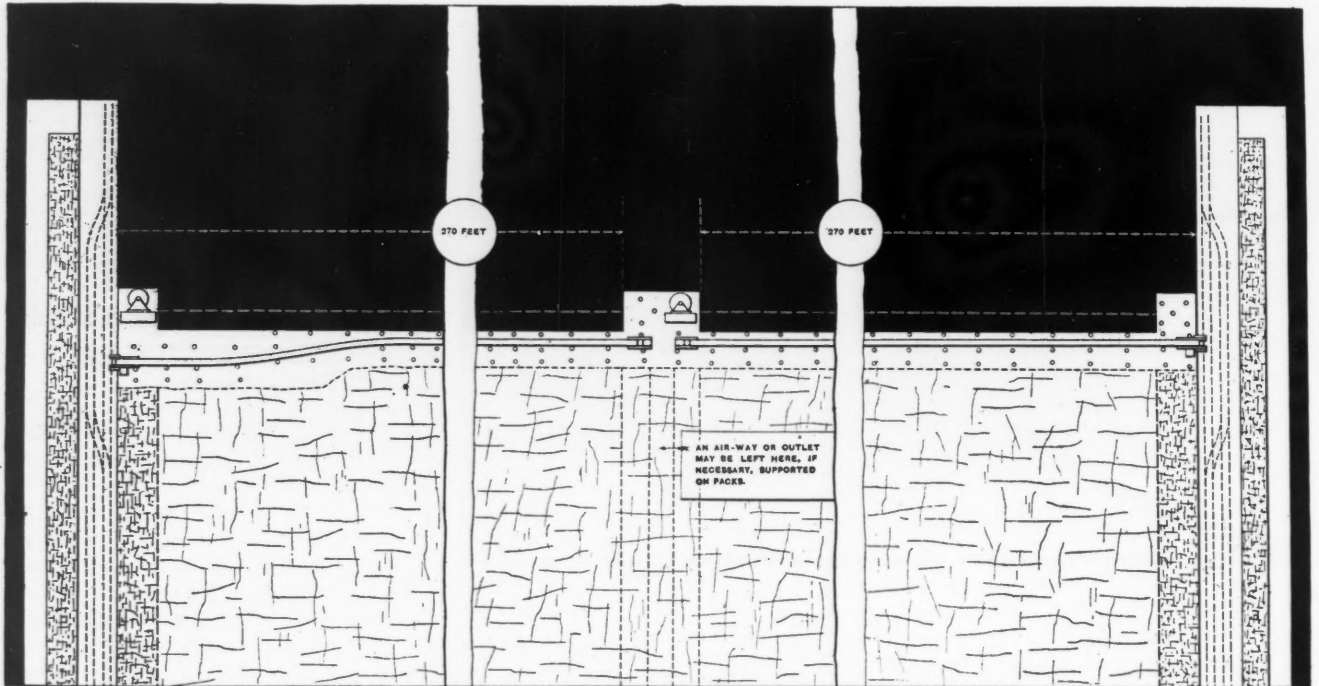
PLAN OF ALTERNATIVE METHODS OF WORKING LONGWALL ON THE CONVEYER SYSTEM
